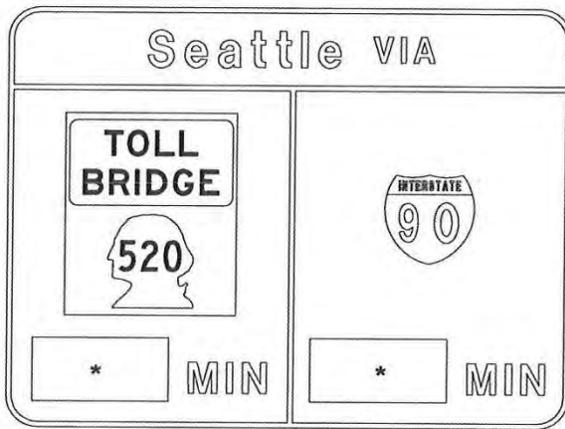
I-405 Travel Time Sign Detail, Multi-Route.
